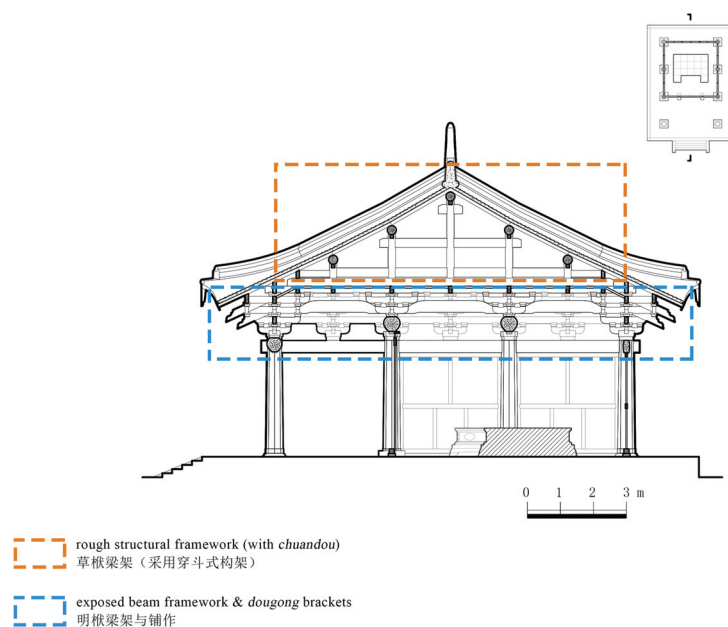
Transverse section of the main hall reconstruction. Drawing by authors.
